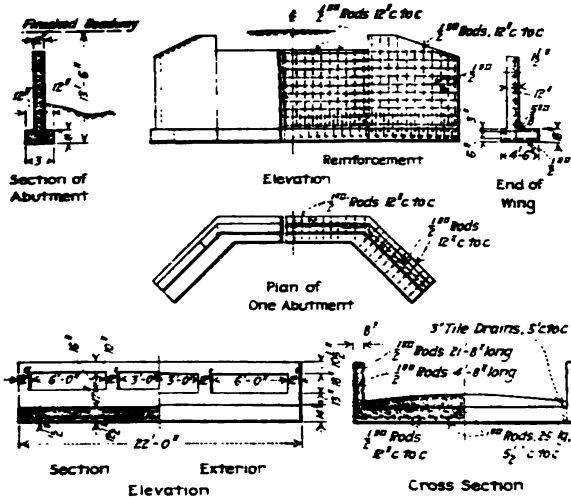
Typical slab bridge, Illinois Highway Commission. Abutment wings of the cantilever type. Main wall vertical slab supported at top by superstructure and at base by footing.
